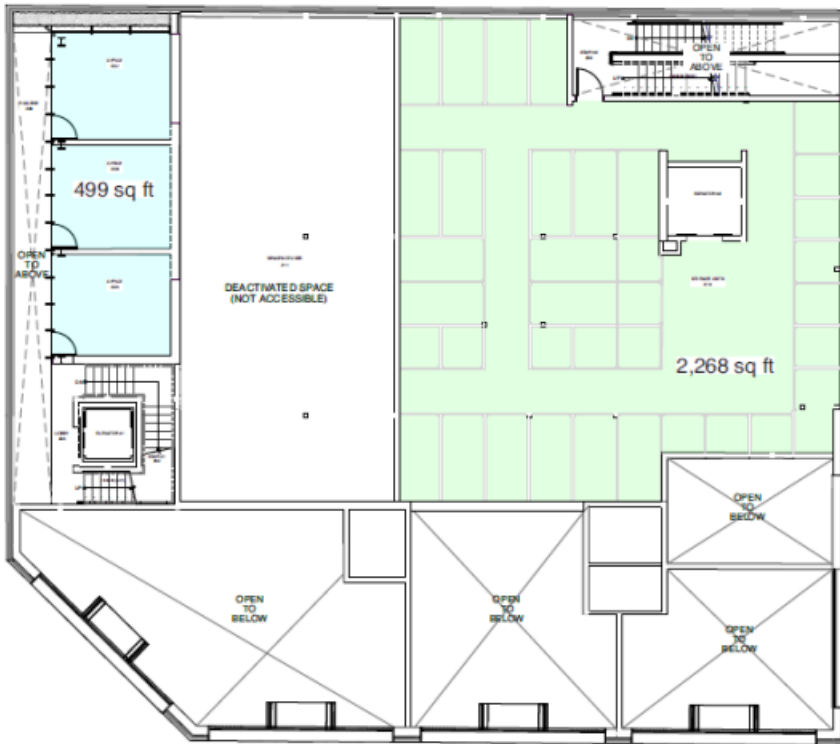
through 5 illustrate proposed floor area; areas that have not been counted toward floor area appear in white. The proposed second floor includes a 1,340 square-foot decommissioned space. The applicant has provided a letter from their structural engineer from Labib Funk and Associates (Attachment 5) justifying the need to keep the decommissioned area as it is structurally critical for seismic transfer of lateral forces to the lateral force resisting system
